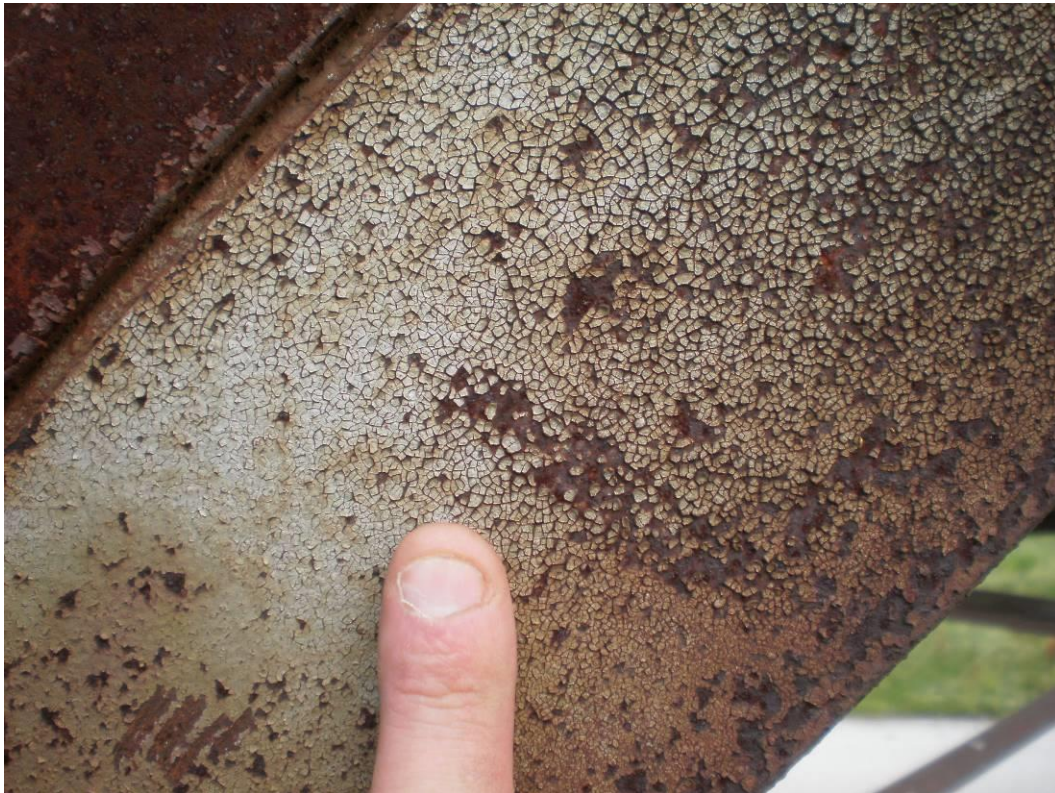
Rust on Floorbeams and Floorbeam Ends
